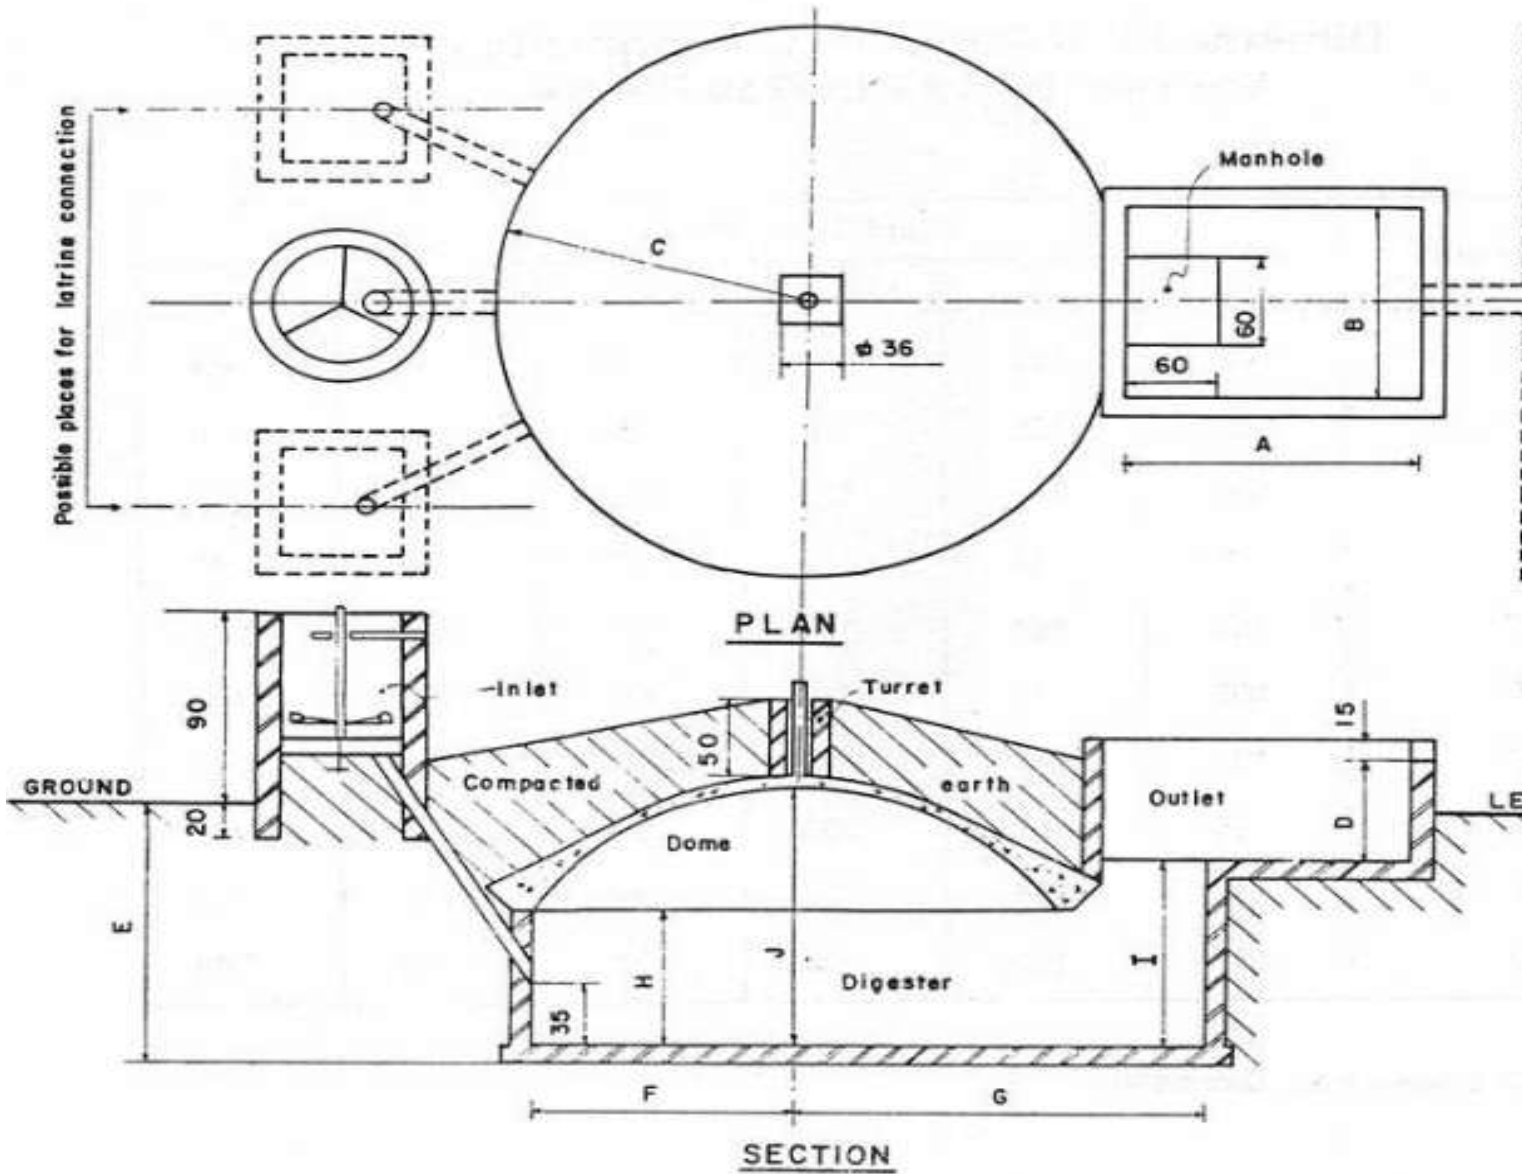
Detail drawing of Fixed Dome Biogas Plant
